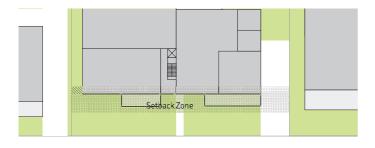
DIAGRAM 8: FRONT OF BUILDING TO BE BUILT WITHIN THE MINIMUM AND MAXIMUM STREET SETBACK ZONE.
